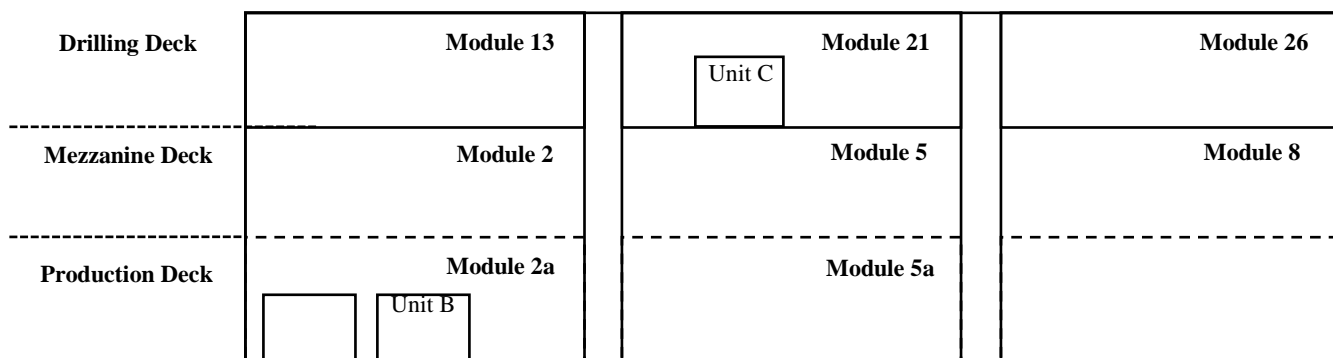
North elevation of Thistle Alpha (adapted from Appendix E)
